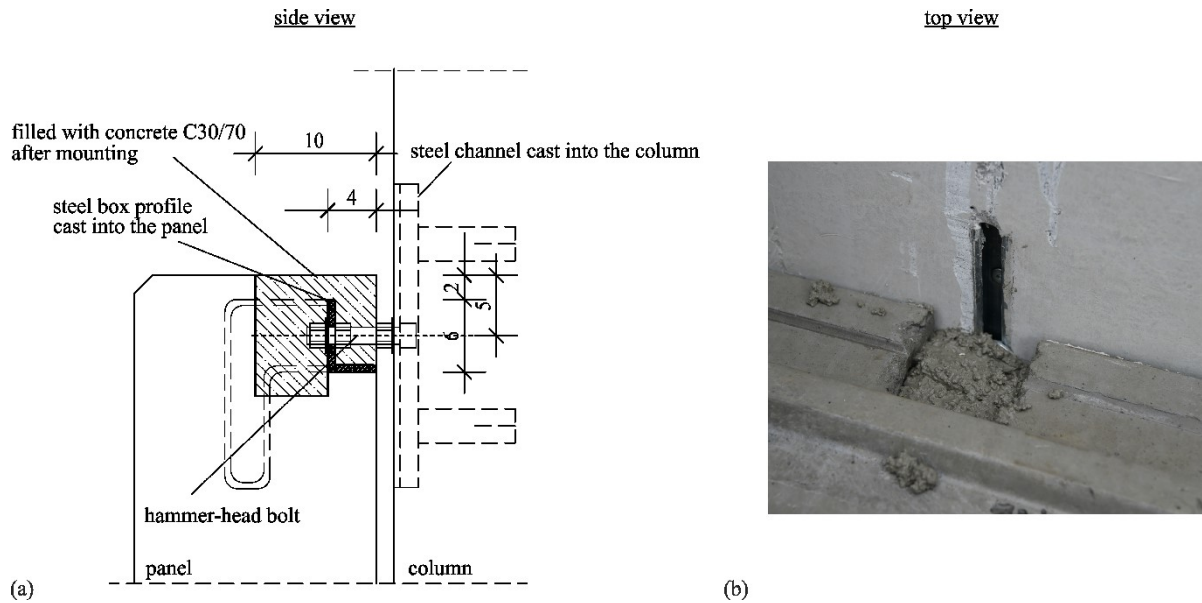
Top cladding connection filled with concrete: (a) sketch of a side view (Bužinel, 2019) and (b) photo of the connection taken at the construction site
